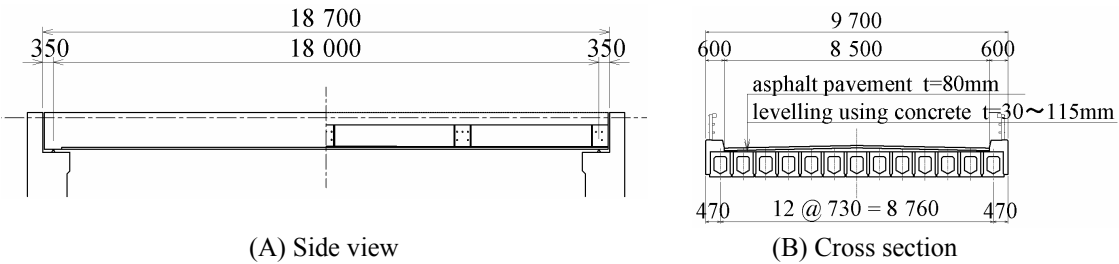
Prestressed concrete hollow bridge for LCC calculation.
